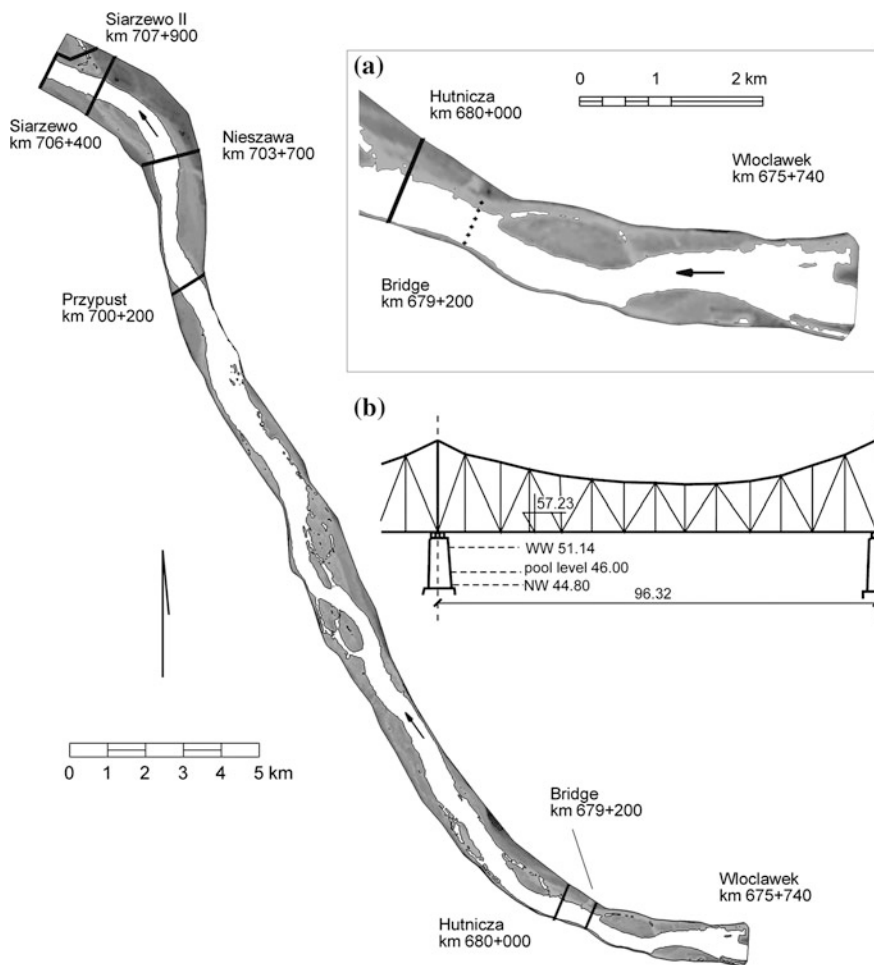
Vistula River section downstream of the Włocławek Dam with potentially possible locational variants of the new dam; Hutnicza Dam detail with bridge piers location (a); Typical section of the Rydz Śmigły Bridge in km 679 + 200 (b)
